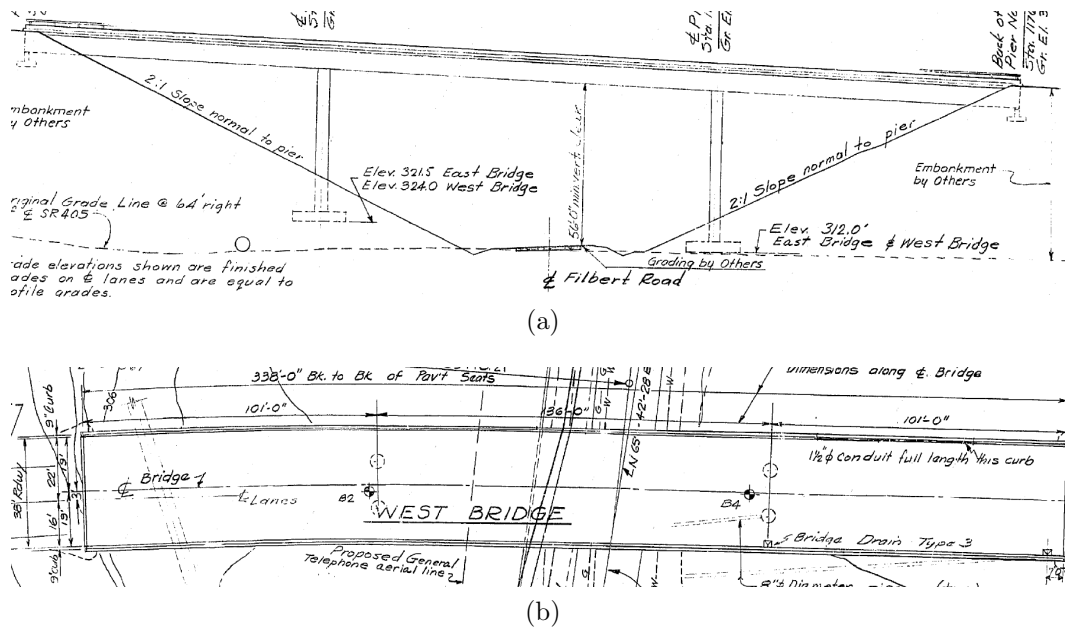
Bridge 4 in (a) elevation and (b) plan view
